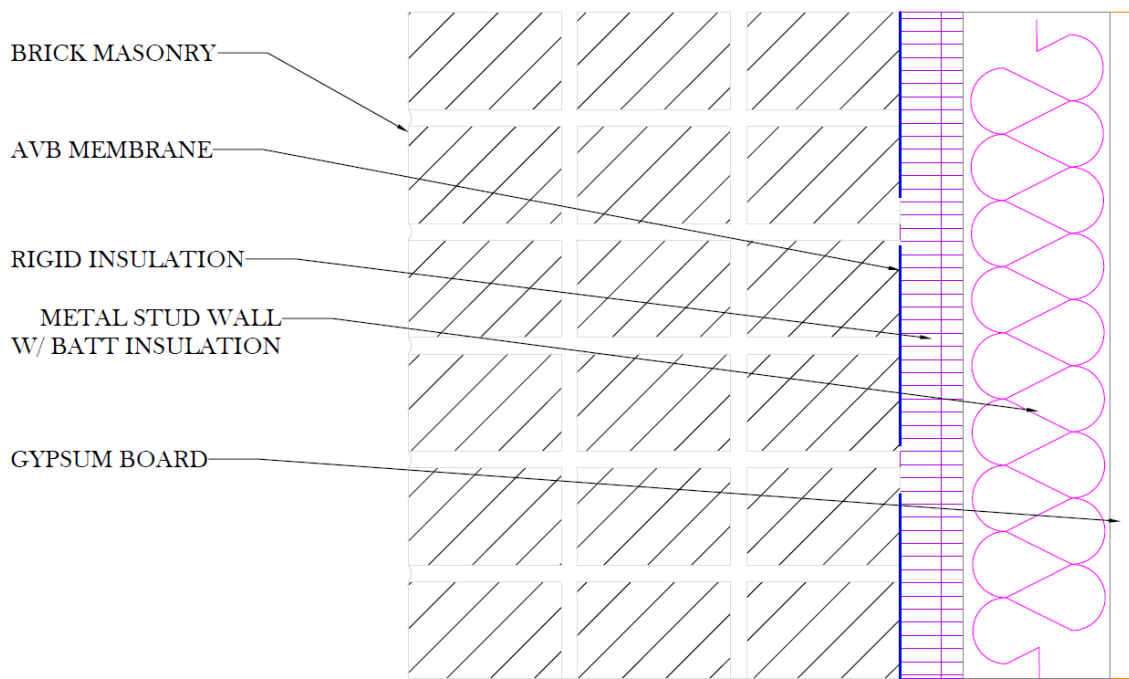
Stratton Hall Schematic Drawing 1-Wall Section
